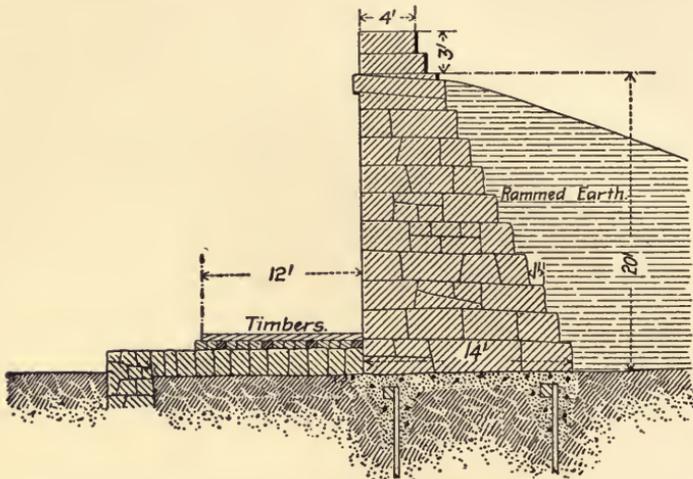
MASONRY DAM AT SOUTHTONING.
